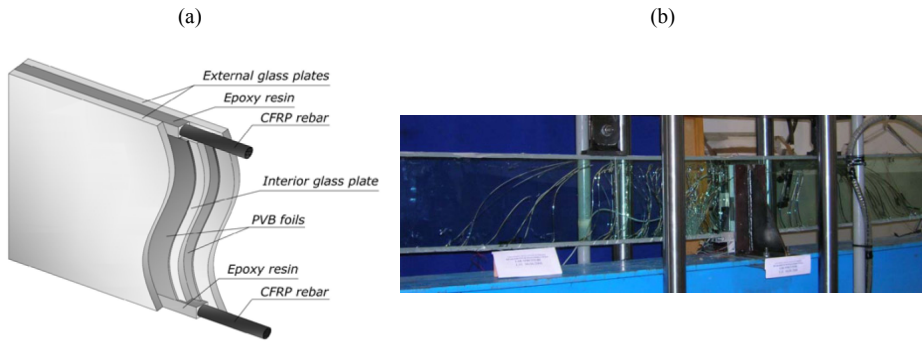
CFRP reinforced glass beams, Antonelli & Gacnacci
